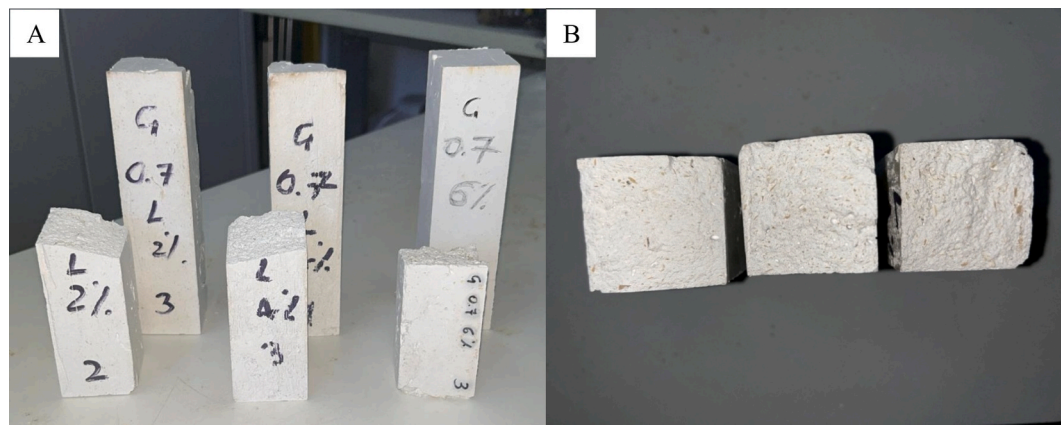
Surface appearance of the developed biocomposites: (A) intact and fractured specimens produced with 2, 4, and 6 wt% WFW ($W/B = 0.7$); (B) fracture surfaces of the specimens, from left to right corresponding to 2, 4, and 6 wt% WFW ($W/B = 0.7$).
